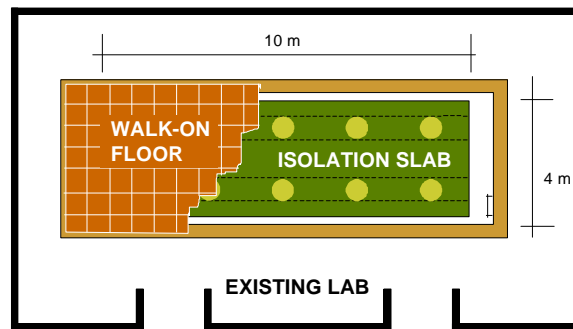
Plan view of lab and isolation slab with a portion of the walk-on floor cut away. (Drawing courtesy HDR, Inc.)
